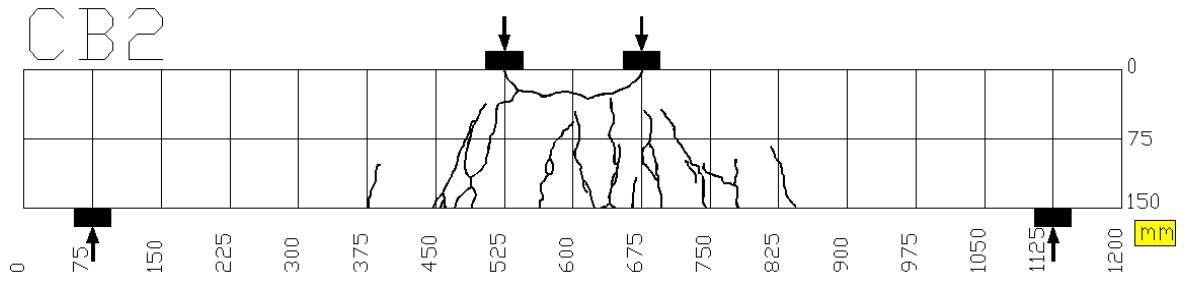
Crack Pattern for Beam (CB2) At Failure
